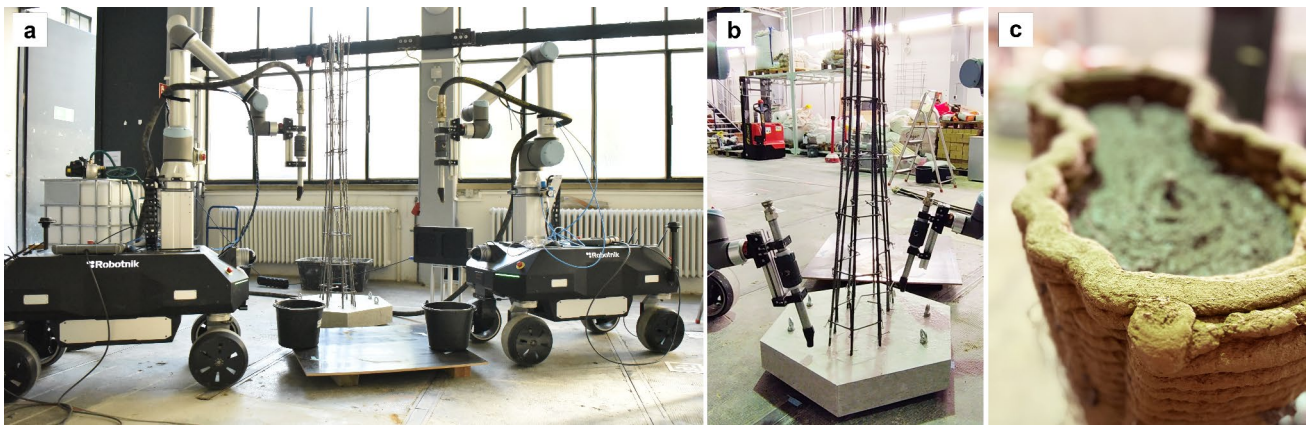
a, b Dry-run for dual Robot Setup printing around reinforcement cage, c Cast earthen formwork
